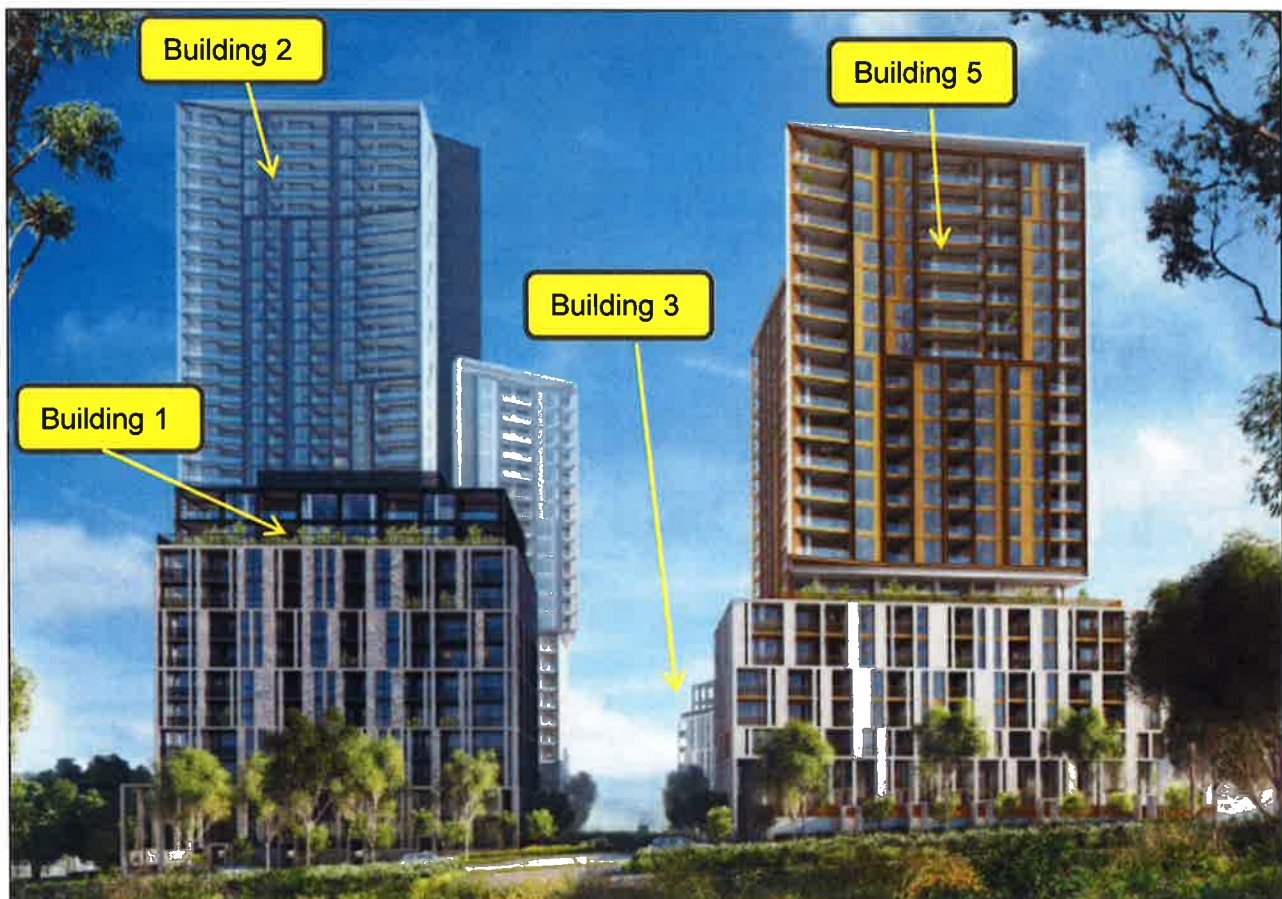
Revised Figtree Drive elevations (Source: RtS)
